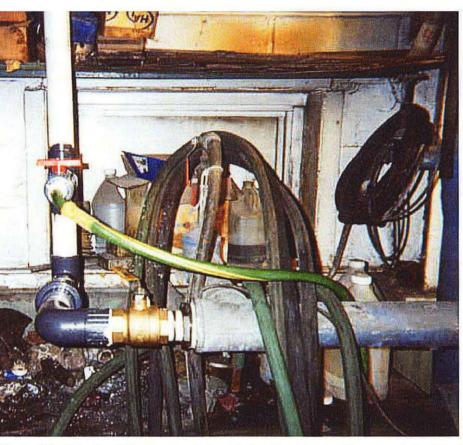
Looking east, picture taken inside the Tecumseh facility's boiler room, which shows the connection of the lactate injection system to Tecumseh's pressurized water line (connection and indoor piping constructed by Tecumseh).
